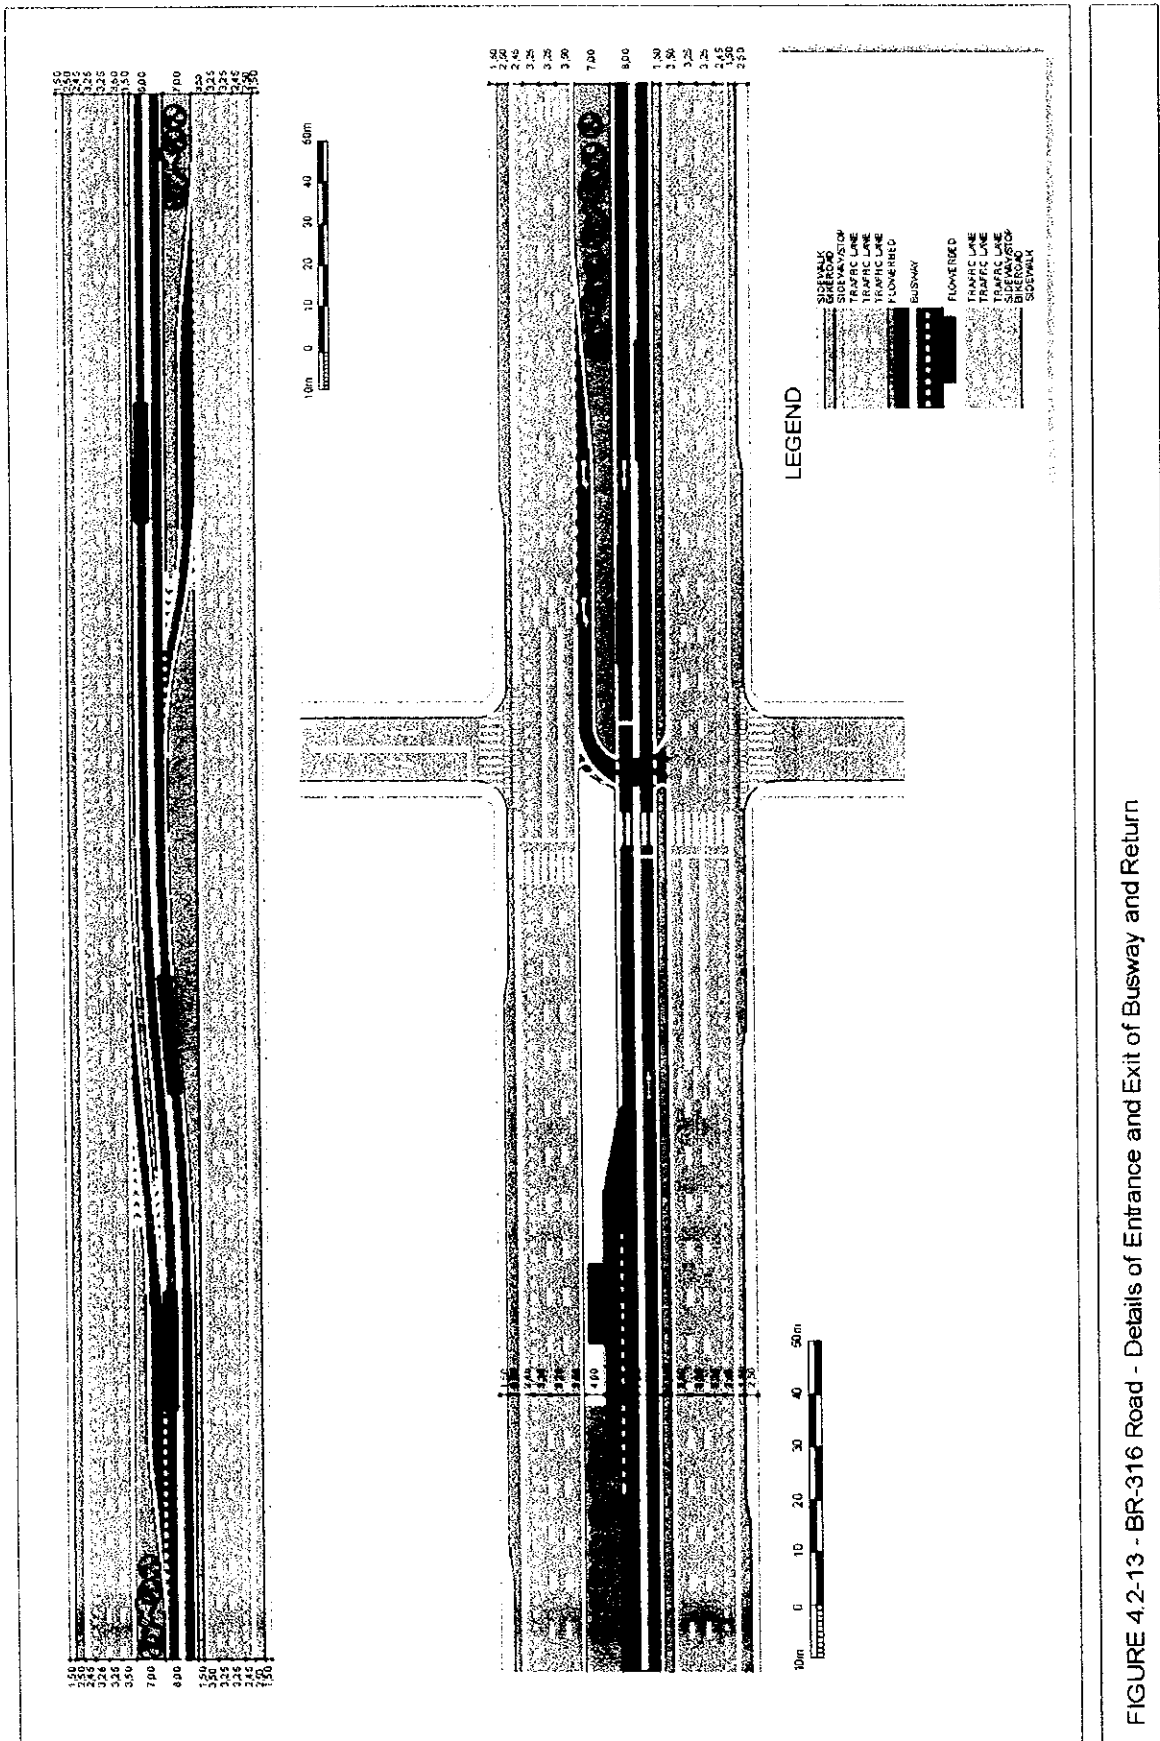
BR-316 Road - Details of Entrance and Exit of Busway and Return
